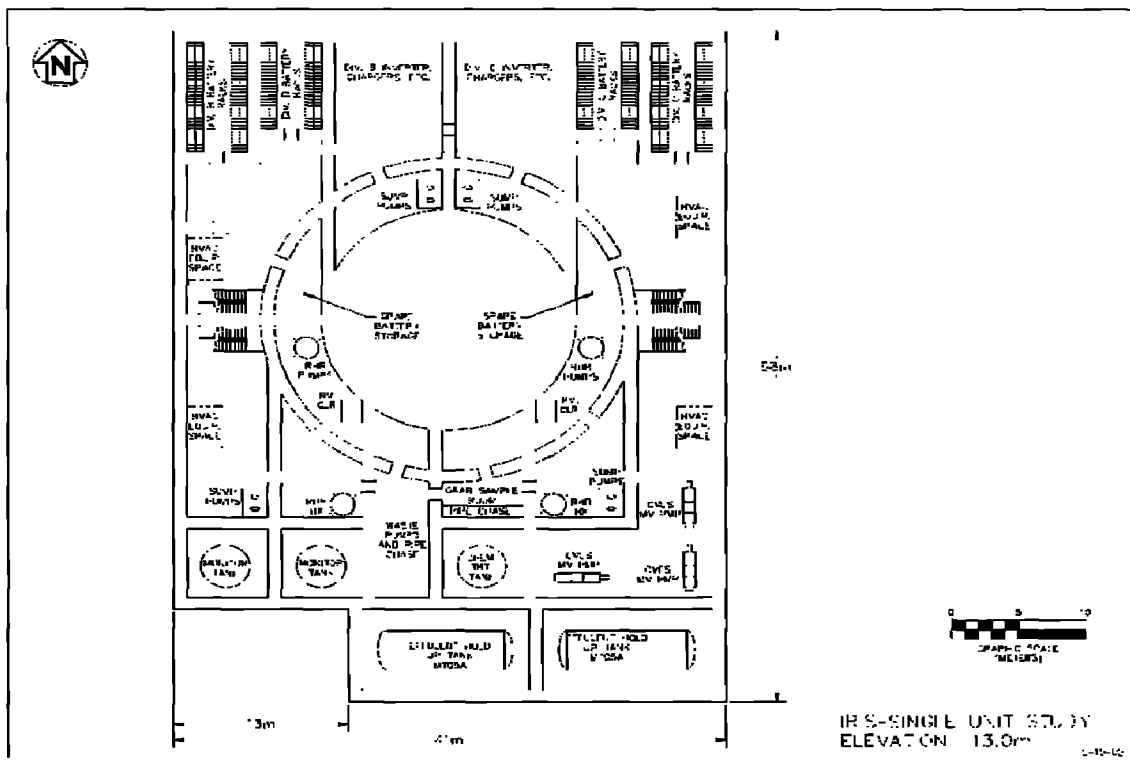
IRIS – Single Unit Plan View at Elevation –13 Meters (Basemat)
